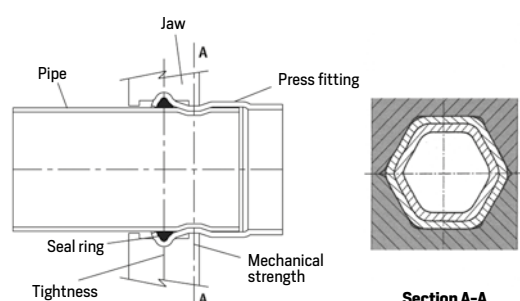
Section through an inoxPRES / steelPRES / aesPRES / marinePRES connection with jaw still in position. Dimensions of $\varnothing 12 \div 35$ mm produce a hexagonal pressing profile.
